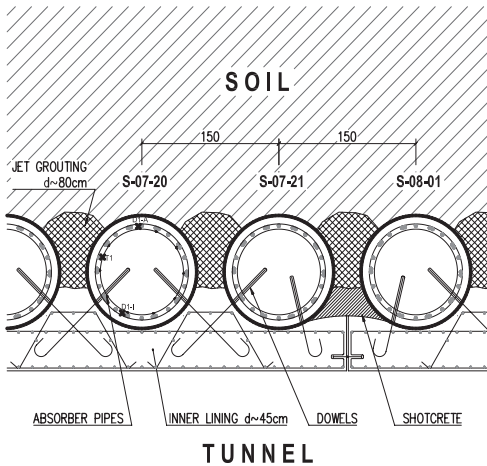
Detail to Fig. 20: Longitudinal section through the energy tunnel wall. The primary lining consists of bored piles with jet-grouted columns in between and is connected to the watertight secondary lining by dowels. Every third pile is equipped with absorber pipes that are situated behind reinforcement bars and thus protected from damage through dowel installation for the inner lining (reinforced concrete panels). Also shown is the location of measurement instruments in pile S-07 – 20.
